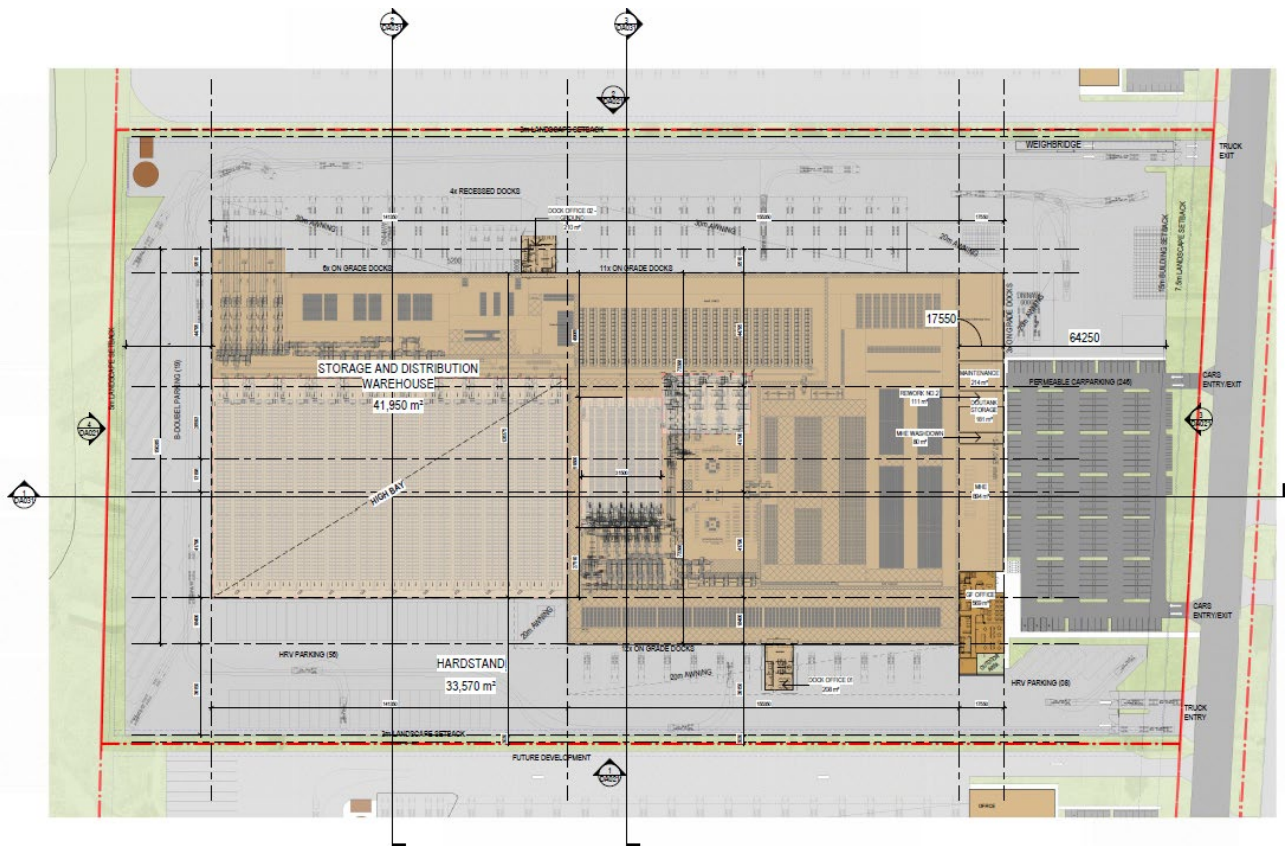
Proposed site plan (Source: Nettleton Tribe, n.d.)
